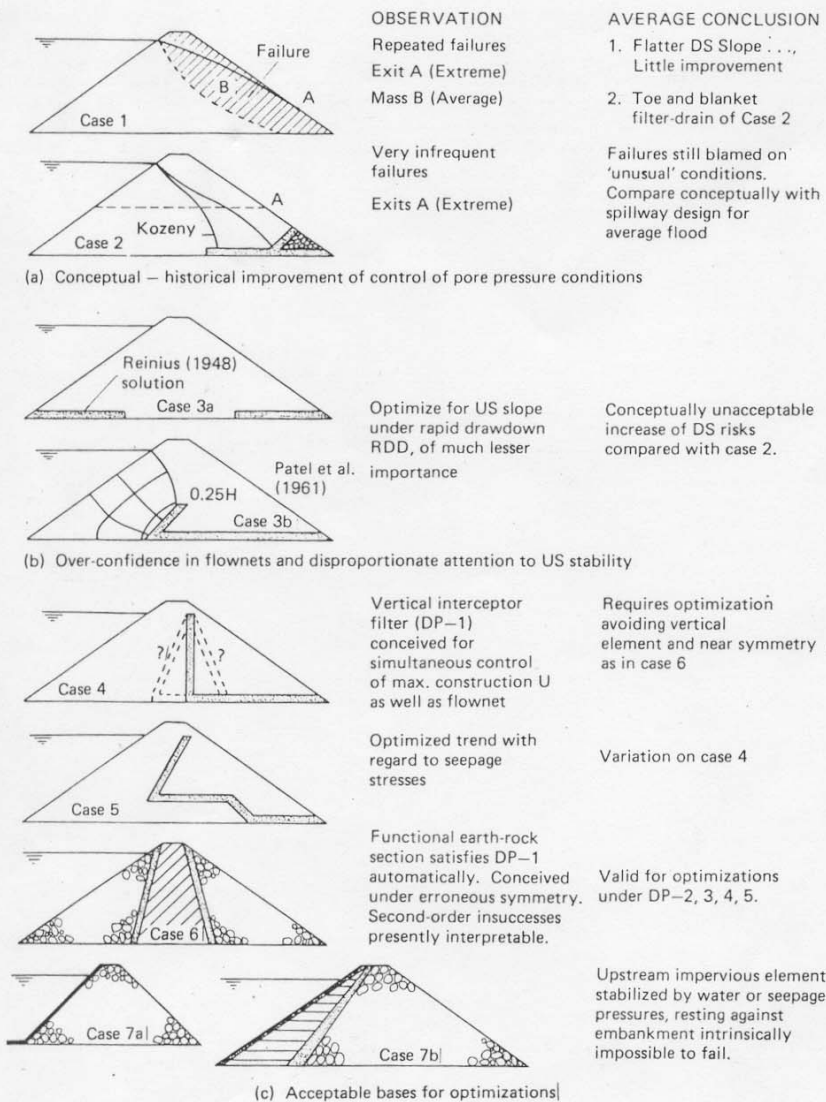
Rationale of conceptual evolution of types of embankment dam and cross-sections
